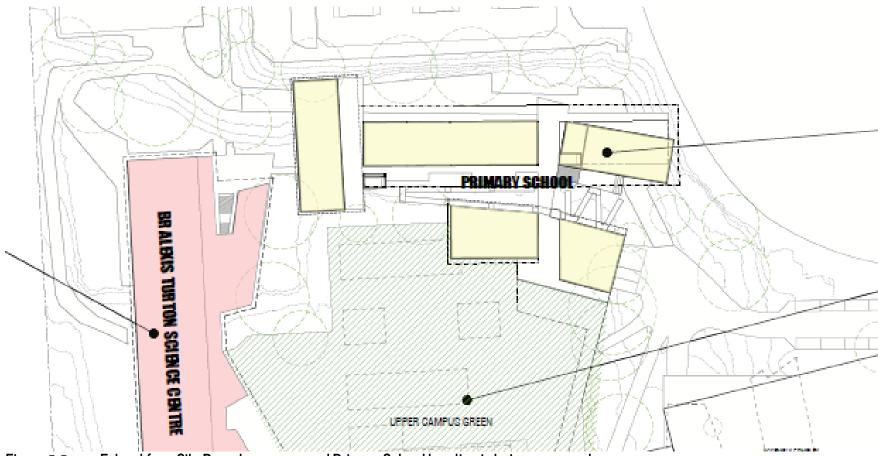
Extract from Site Pan where proposed Primary School location is being proposed Phorm Plans
